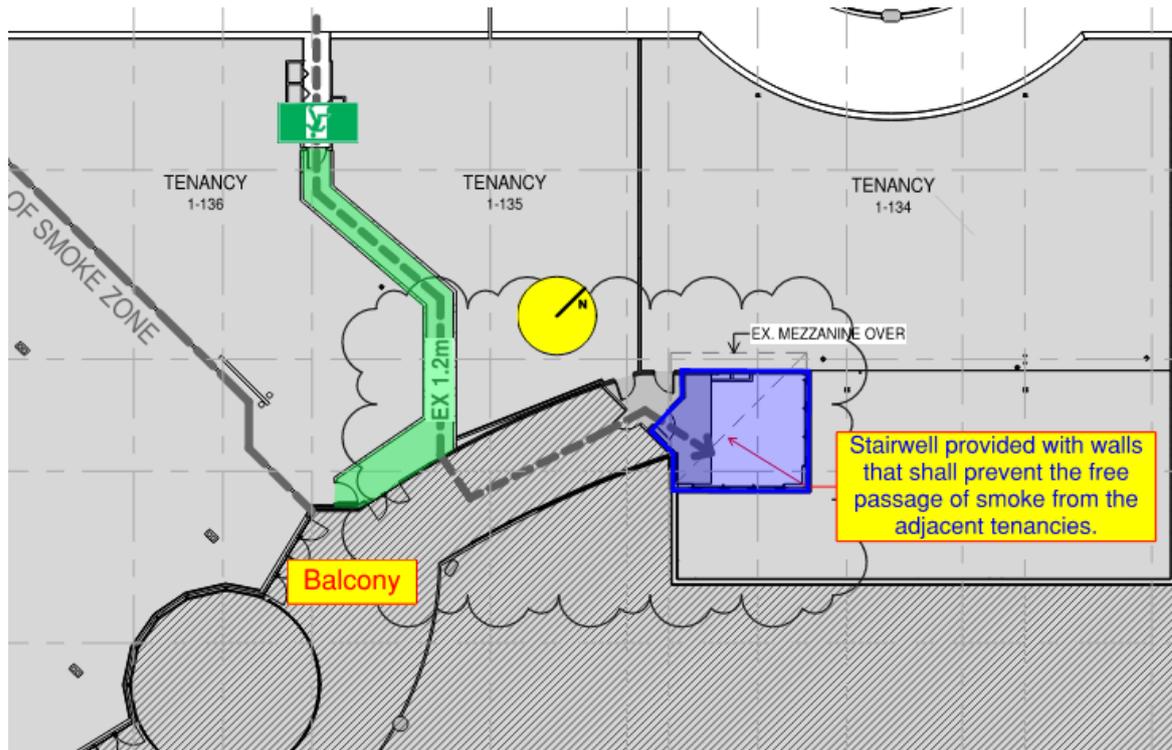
Walls that shall prevent the free passage of smoke on First Floor
